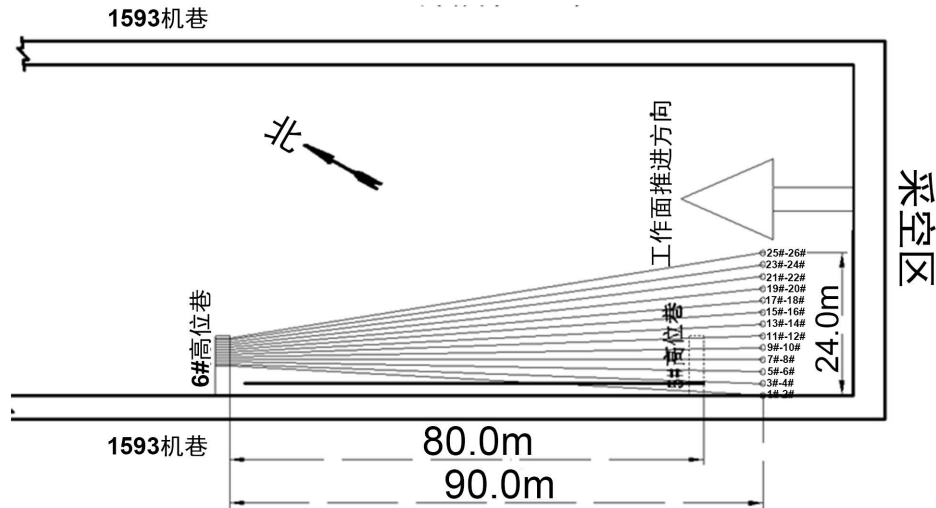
Design drawing of drainage drilling in high roadway drilling site
